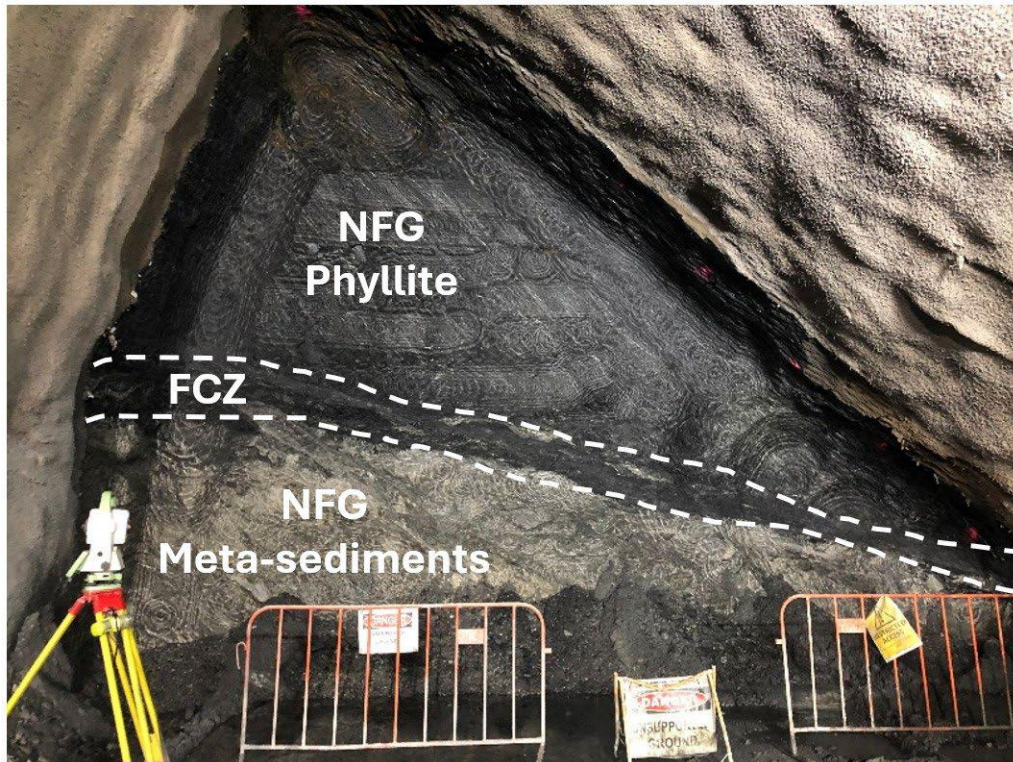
Low-angle fault encountered in the Albert Street Station cavern heading during construction.
